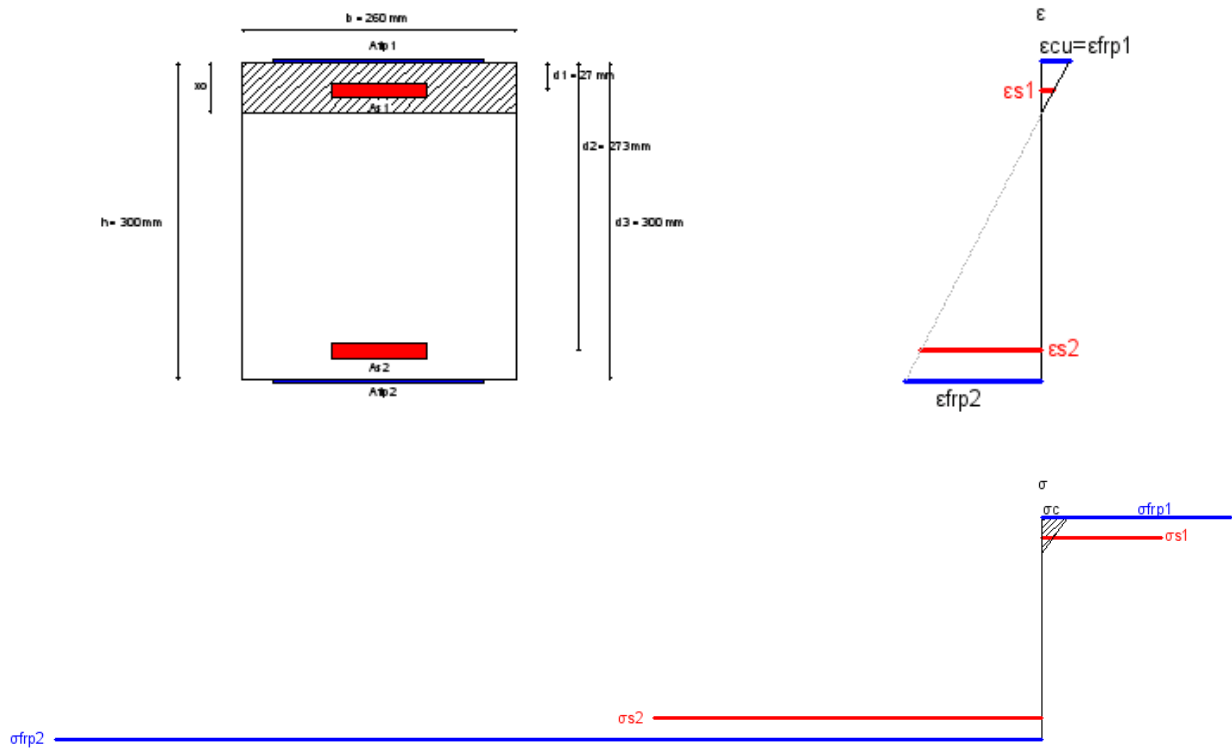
1<sup>st</sup> floor beam (300) section after strengthening
